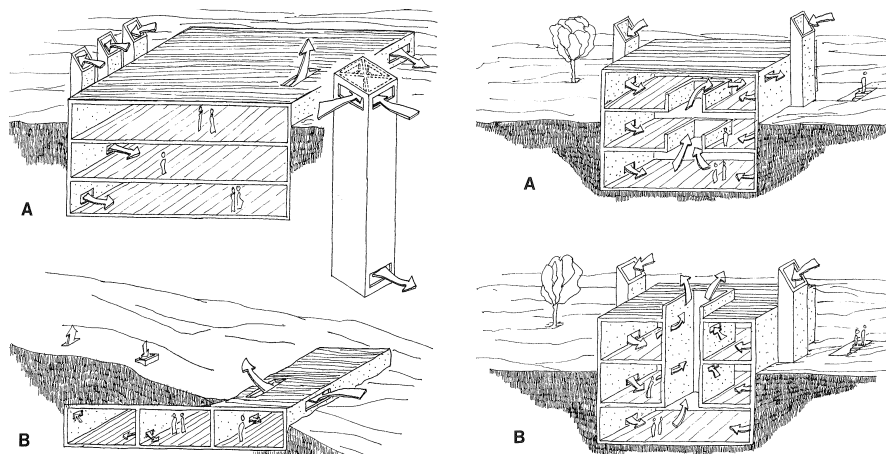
Ventilation systems on underground structures. Golany, 1980
